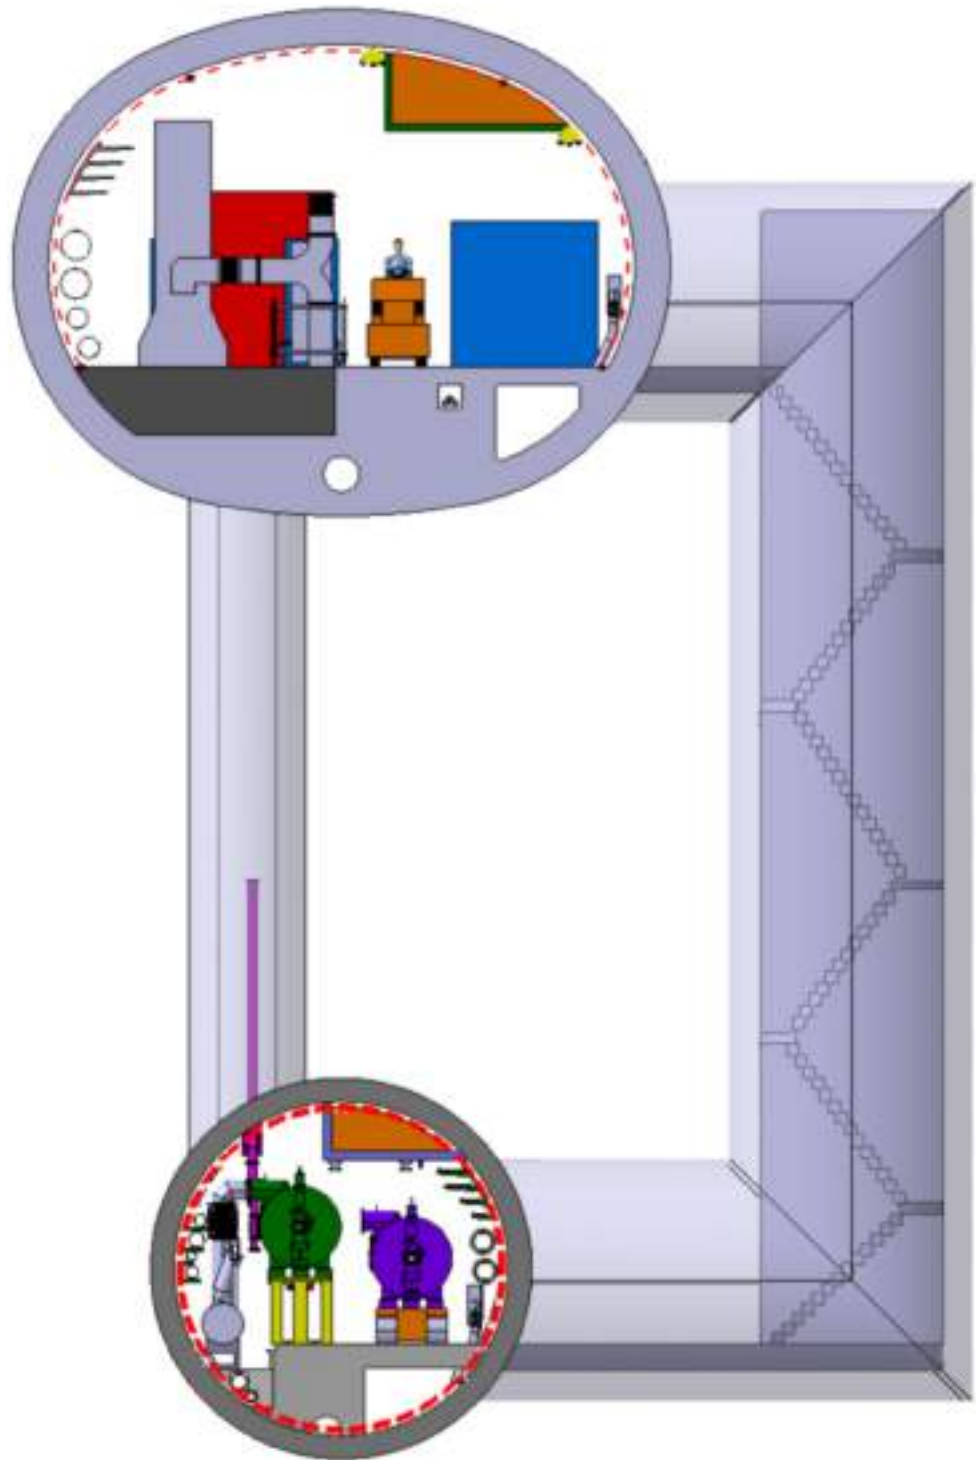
FCC-ee point PL - tunnel and gallery cross-section
